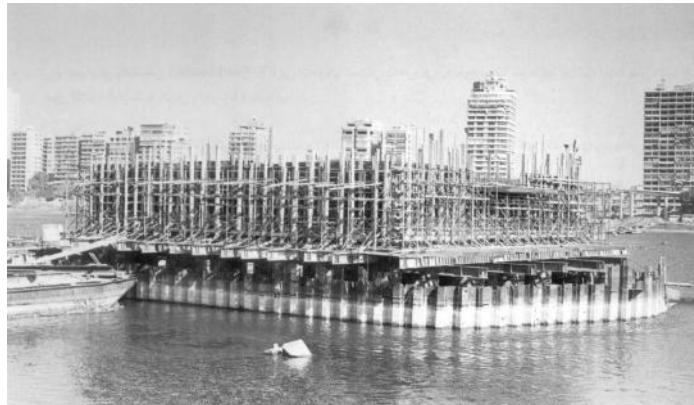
Preparation of the formwork for casting (El-Moneeb Bridge).
